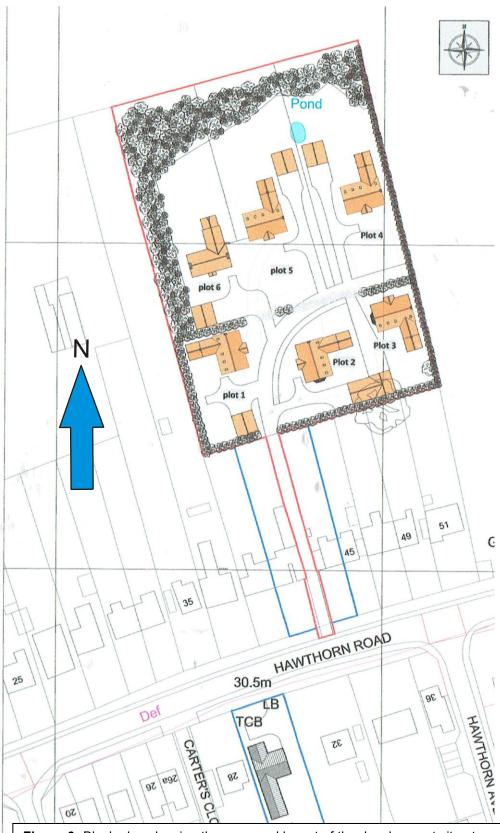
Block plan showing the proposed layout of the development site at an original scale of 1:500, (not to scale), (extract from Architects plan)
